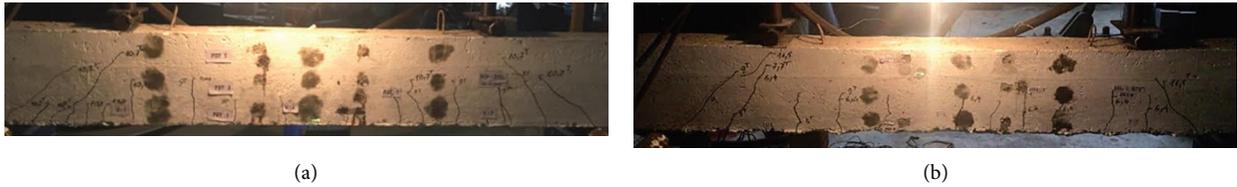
Observed cracks in the concrete beams: (a) there were cracks in the concrete beam (Beam 1); (b) there were cracks in the concrete beam (Beam 2).
